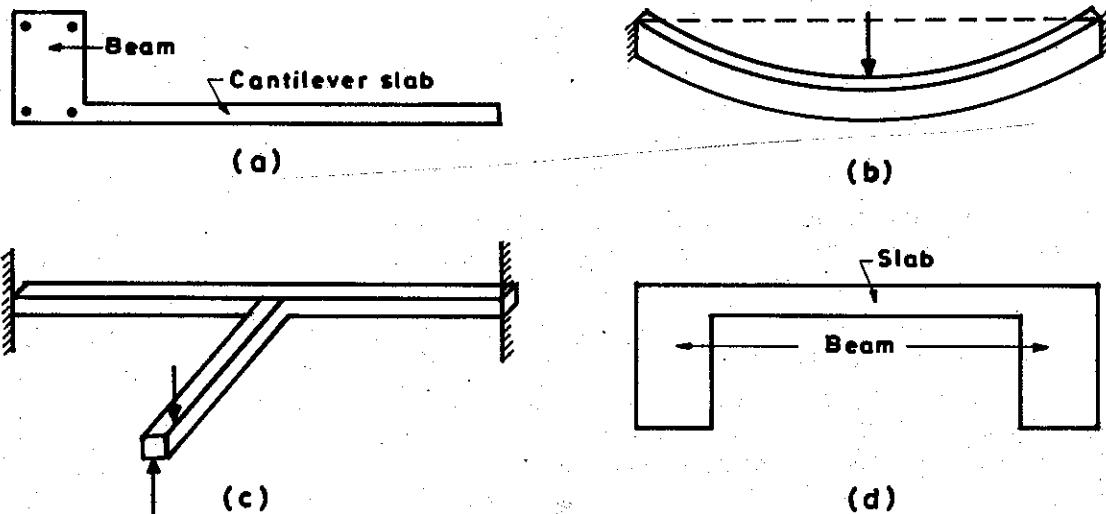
Primary and secondary torsion: (a) Portico slab, (b) Bow girder, (c) Indeterminate frame, (d) Edge beams.
